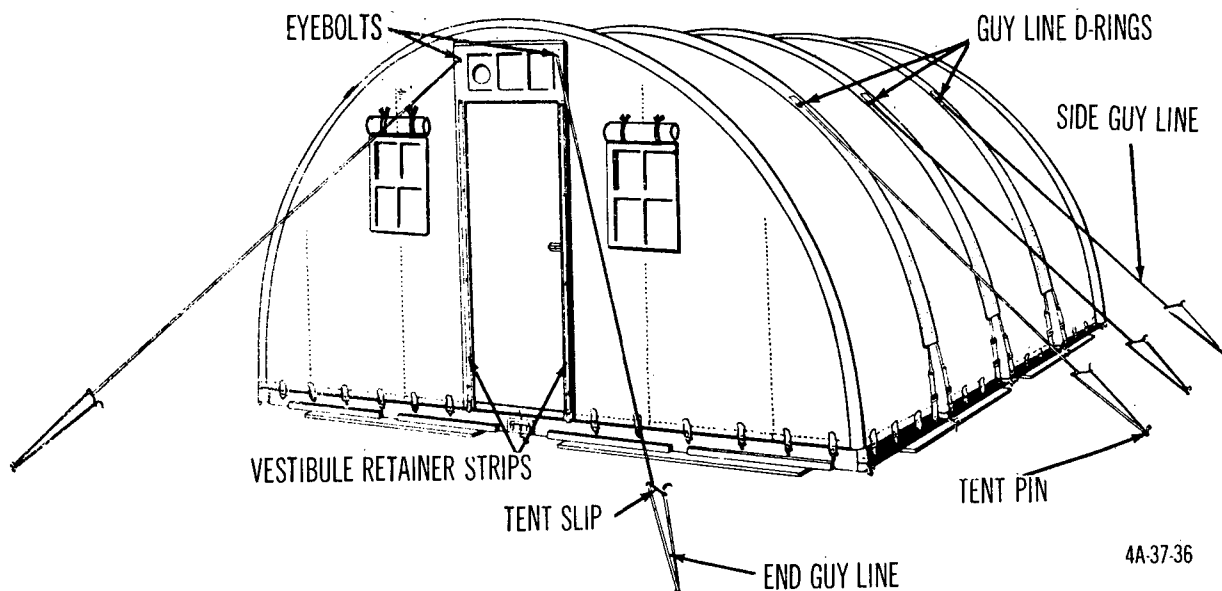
Attaching roof blankets and roof guy bands to frame of tent, frame-type, insulated, sectional.
